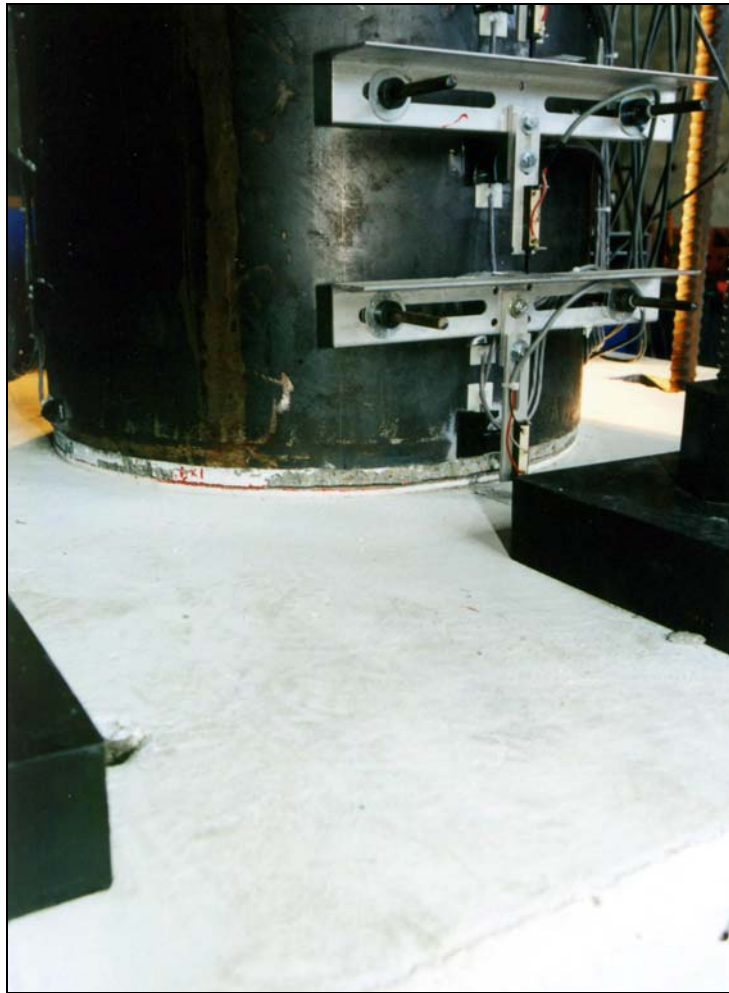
JH2 – Test 1 Residual crack at column base at end of test
